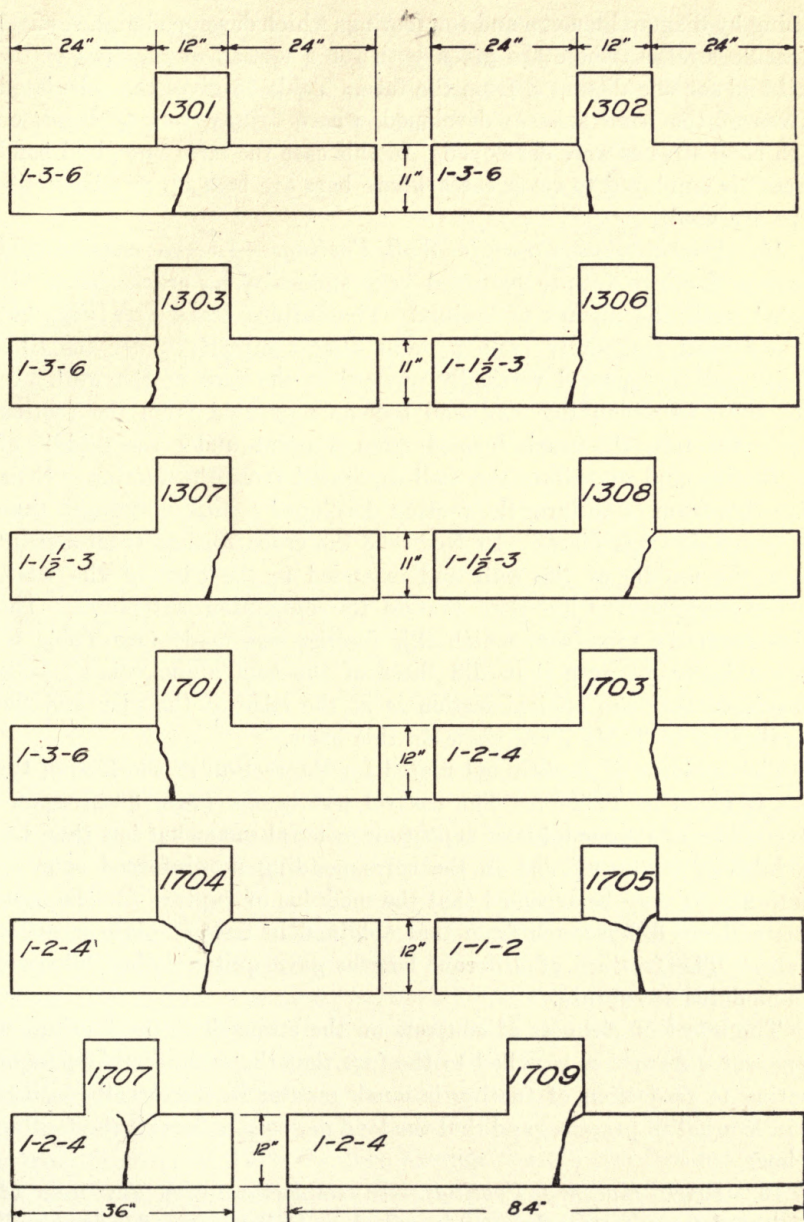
UNREINFORCED CONCRETE WALL FOOTINGS.
